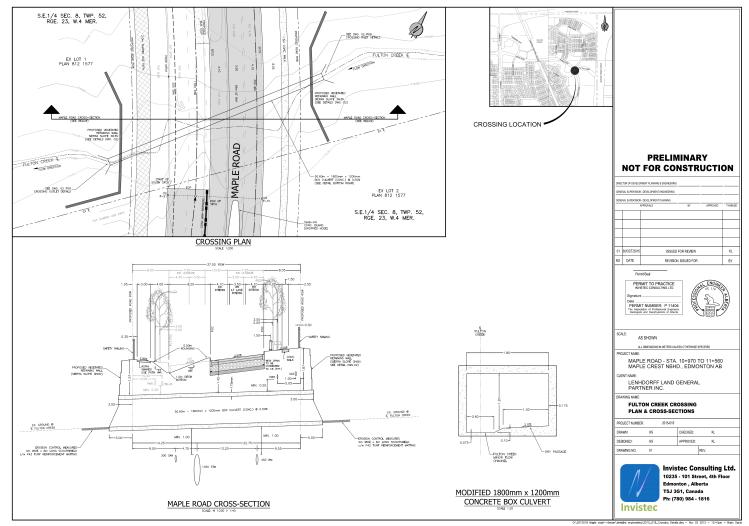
Preliminary design of the modified 1800mm x 1200mm box culvert -Maple Road at Fulton Creek
